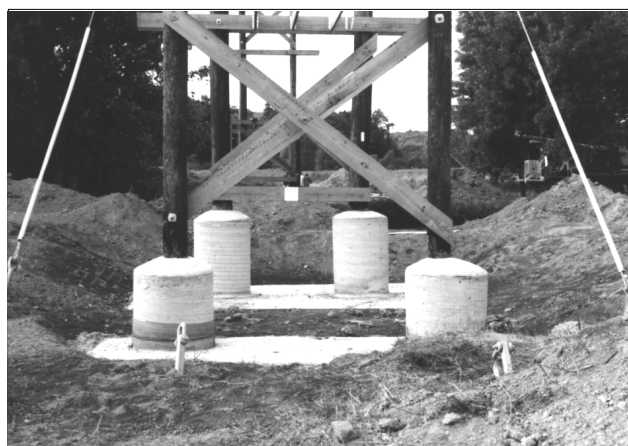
East foundation before backfill. *Photo courtesy of Mr. Tibor Latincsecs.
